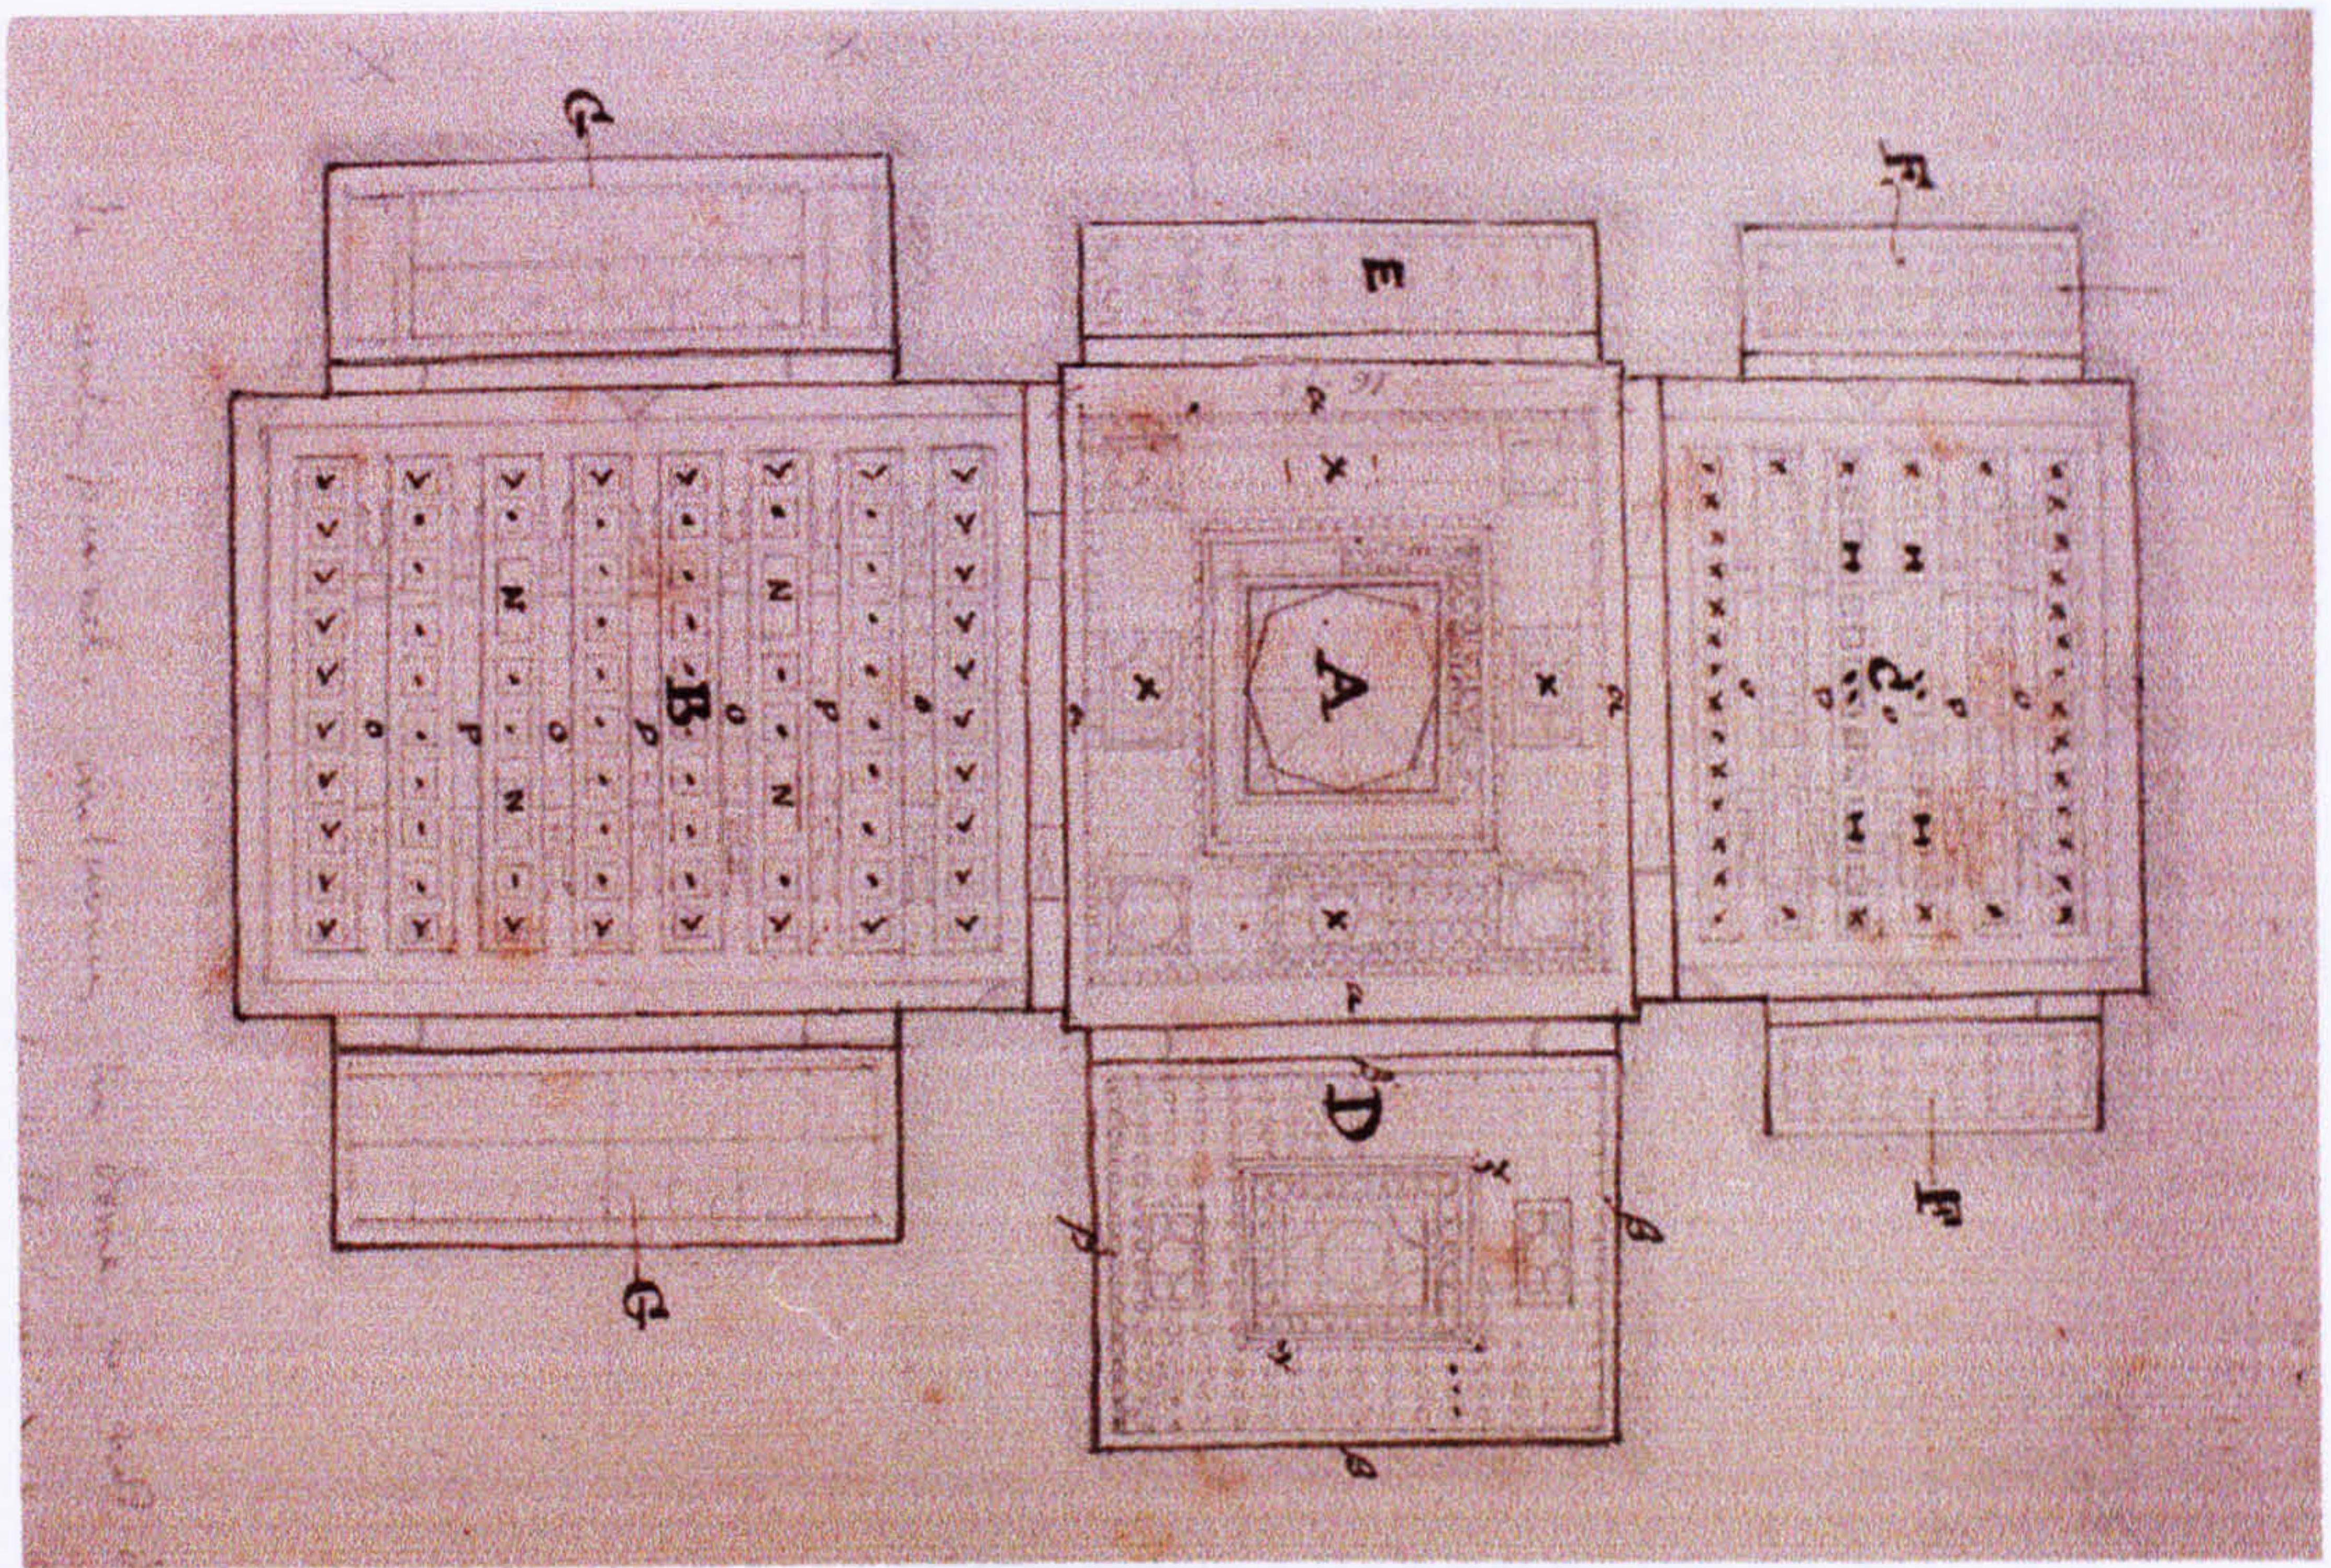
Gama el Ghoury, Cairo: general ceiling plan
